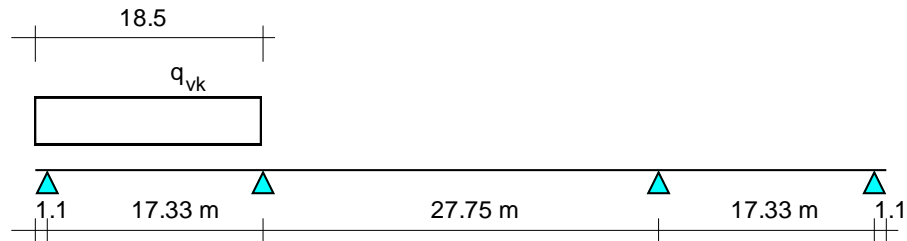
SW/2 arrangement for Load Step 5
